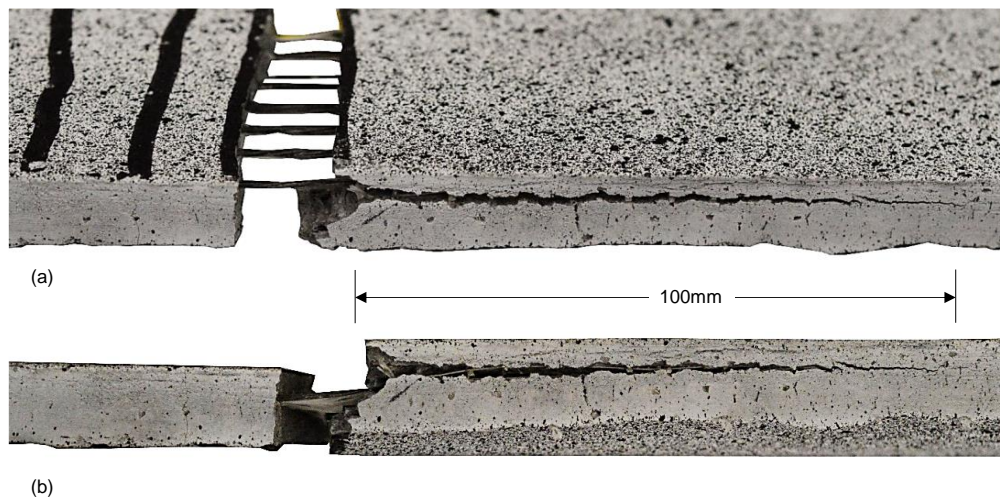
Typical crack pattern observed in lap-splice tests (S4-100-02 specimen)
